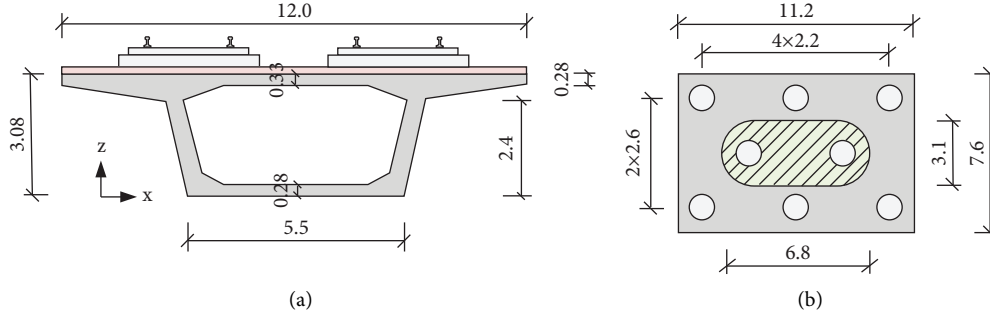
Cross-sectional dimension: (a) girder; (b) pier and piles. (Unit: m).
